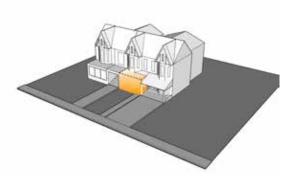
To conserve the legibility of a Converted House-form typology building's architectural style and roof type, front *additions* should generally be limited to one storey.
